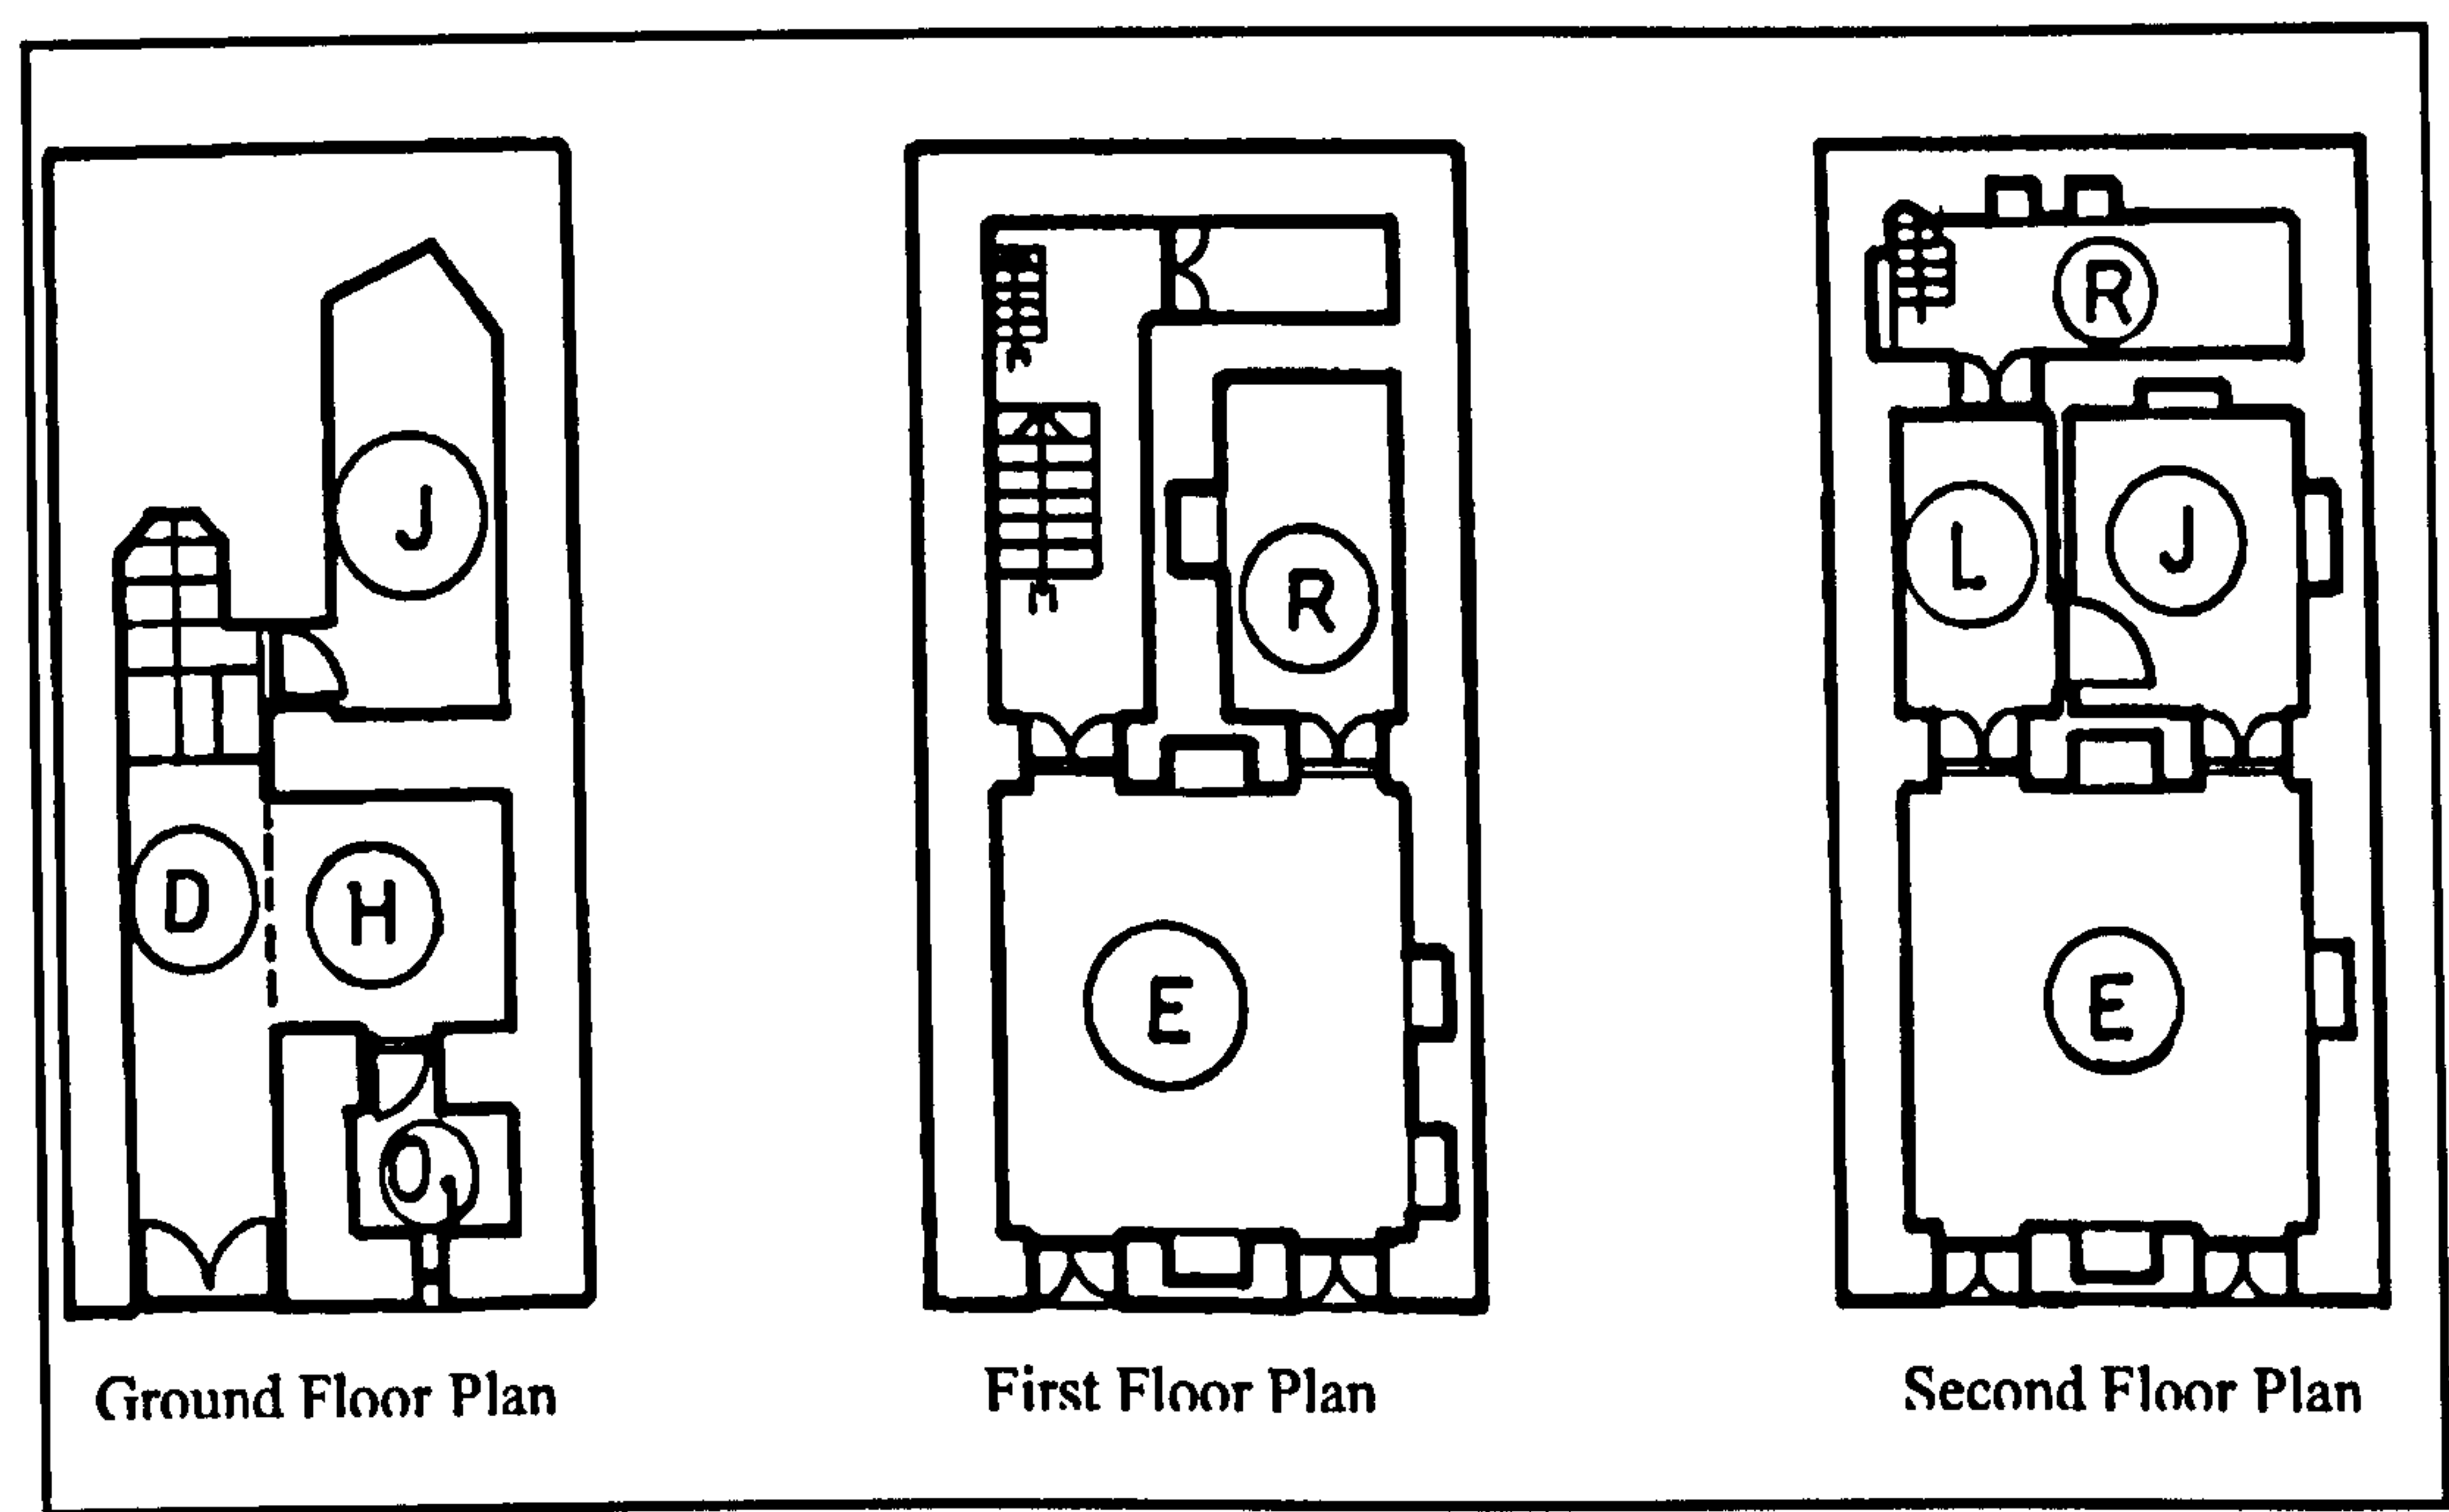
Rural house in *Masooleh*; rooms and family area are located on the upper floors, (Izadi & Kasraian, 1993). D: Lobby. E: Room. H: Bath. J: Storeroom. L: Corridor. O: Toilet. R: Storage.
